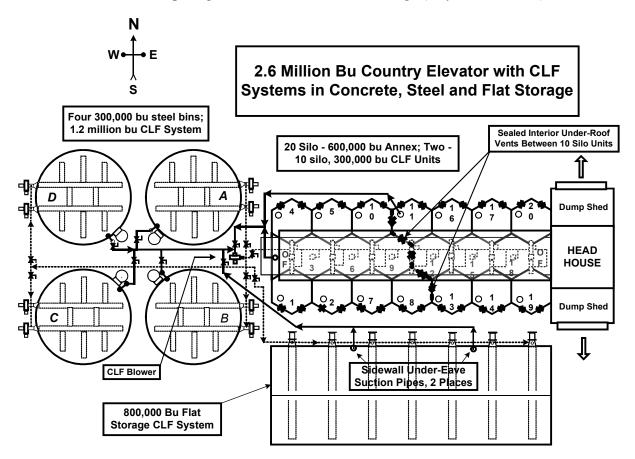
Oklahoma elevator using central *CLF* blower for 4 steel bins, 20 concrete silos, and 1 flat Storage.
